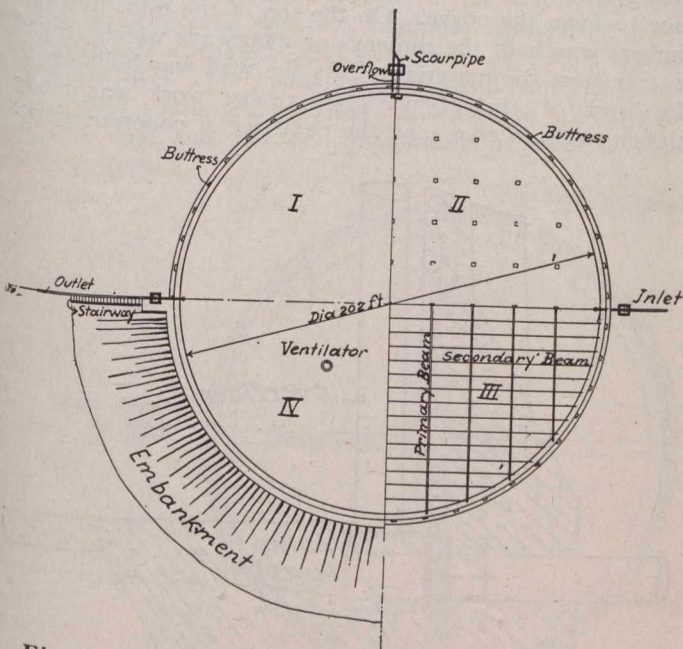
Floor and Walls (I.); Columns (II.); Roof-Beams (III.); and Cover (IV.).
